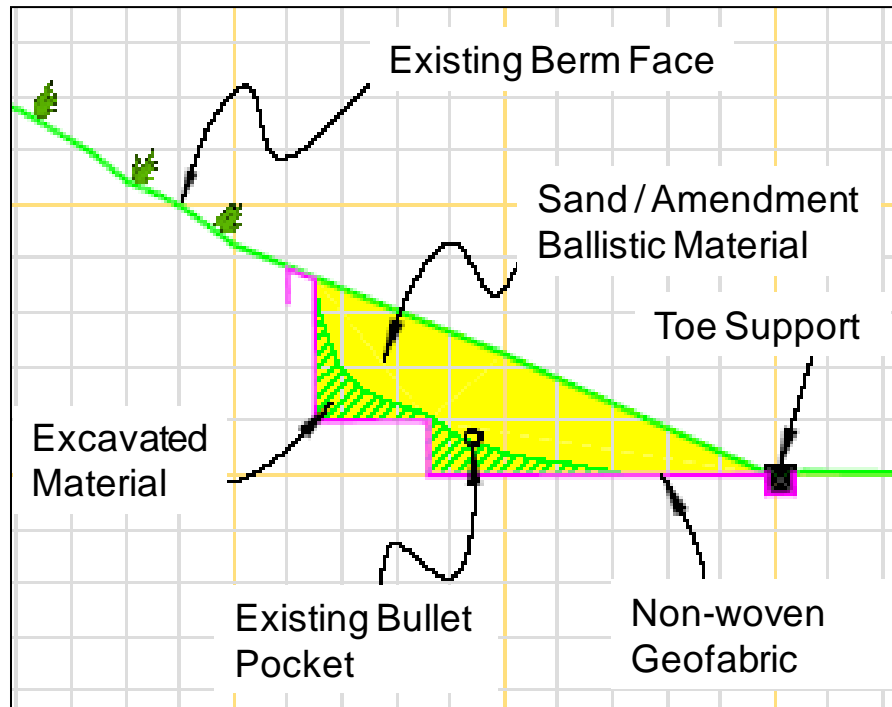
Schematic Cross Section of Typical Range Berm with the PRBerm Technology Application
